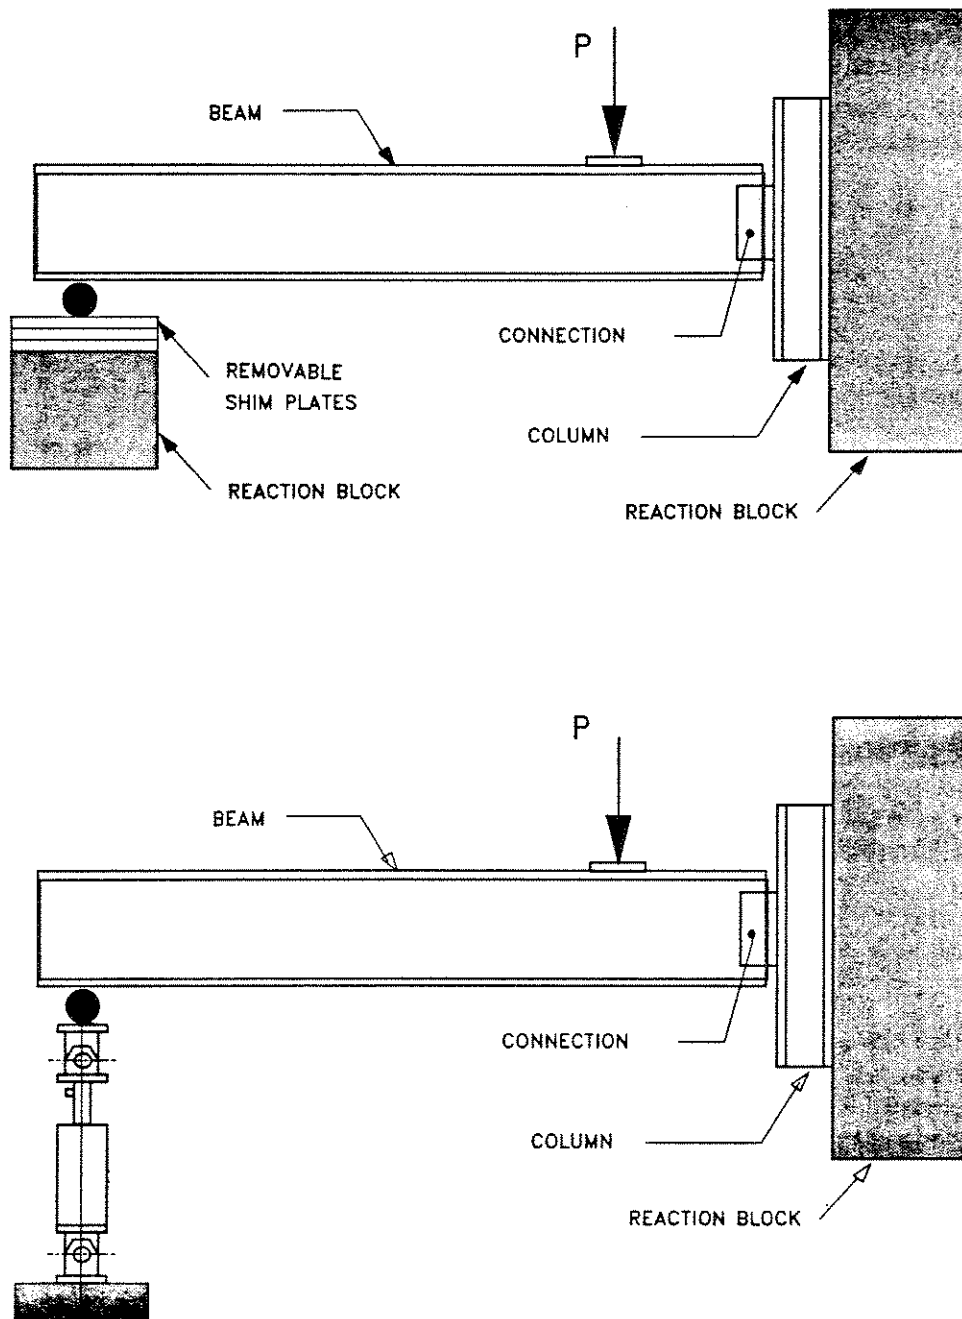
Shear-Rotation Test Set-up Used in Past
